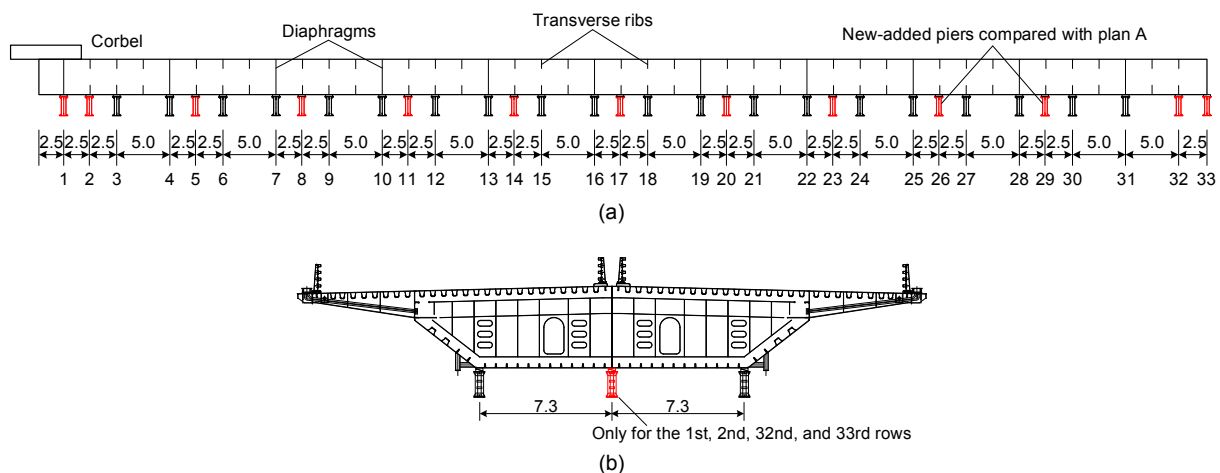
Plan B for the arrangement of supporting piers: (a) longitudinal; (b) transversal (unit: m)
